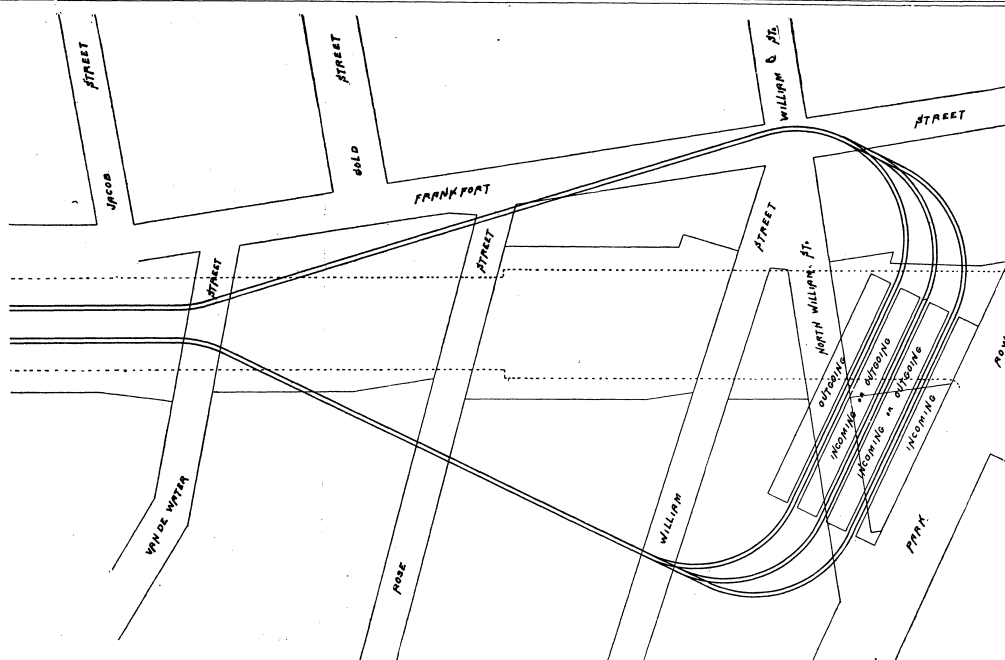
PROPOSED NEW YORK TERMINAL, NEW YORK & BROOKLYN BRIDGE RAILWAY.
